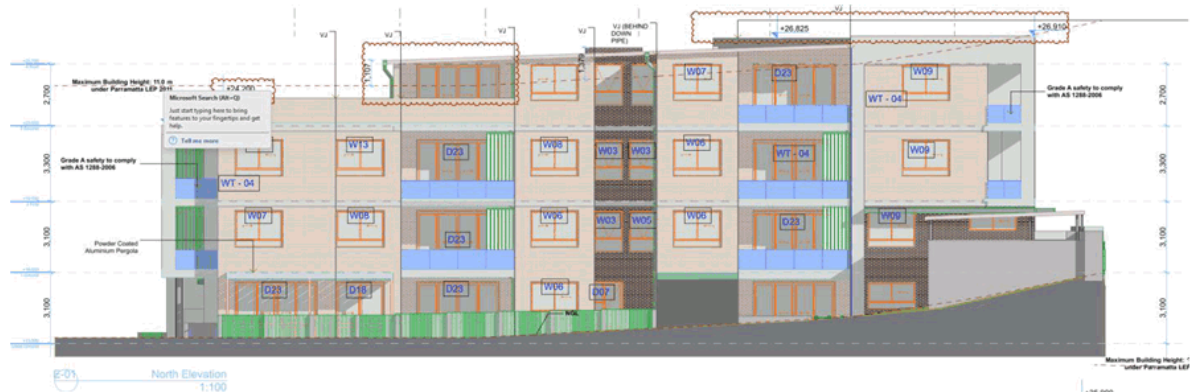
Proposed North Elevation under modification DA/544/2021/B. Source: Design Effects Architects
